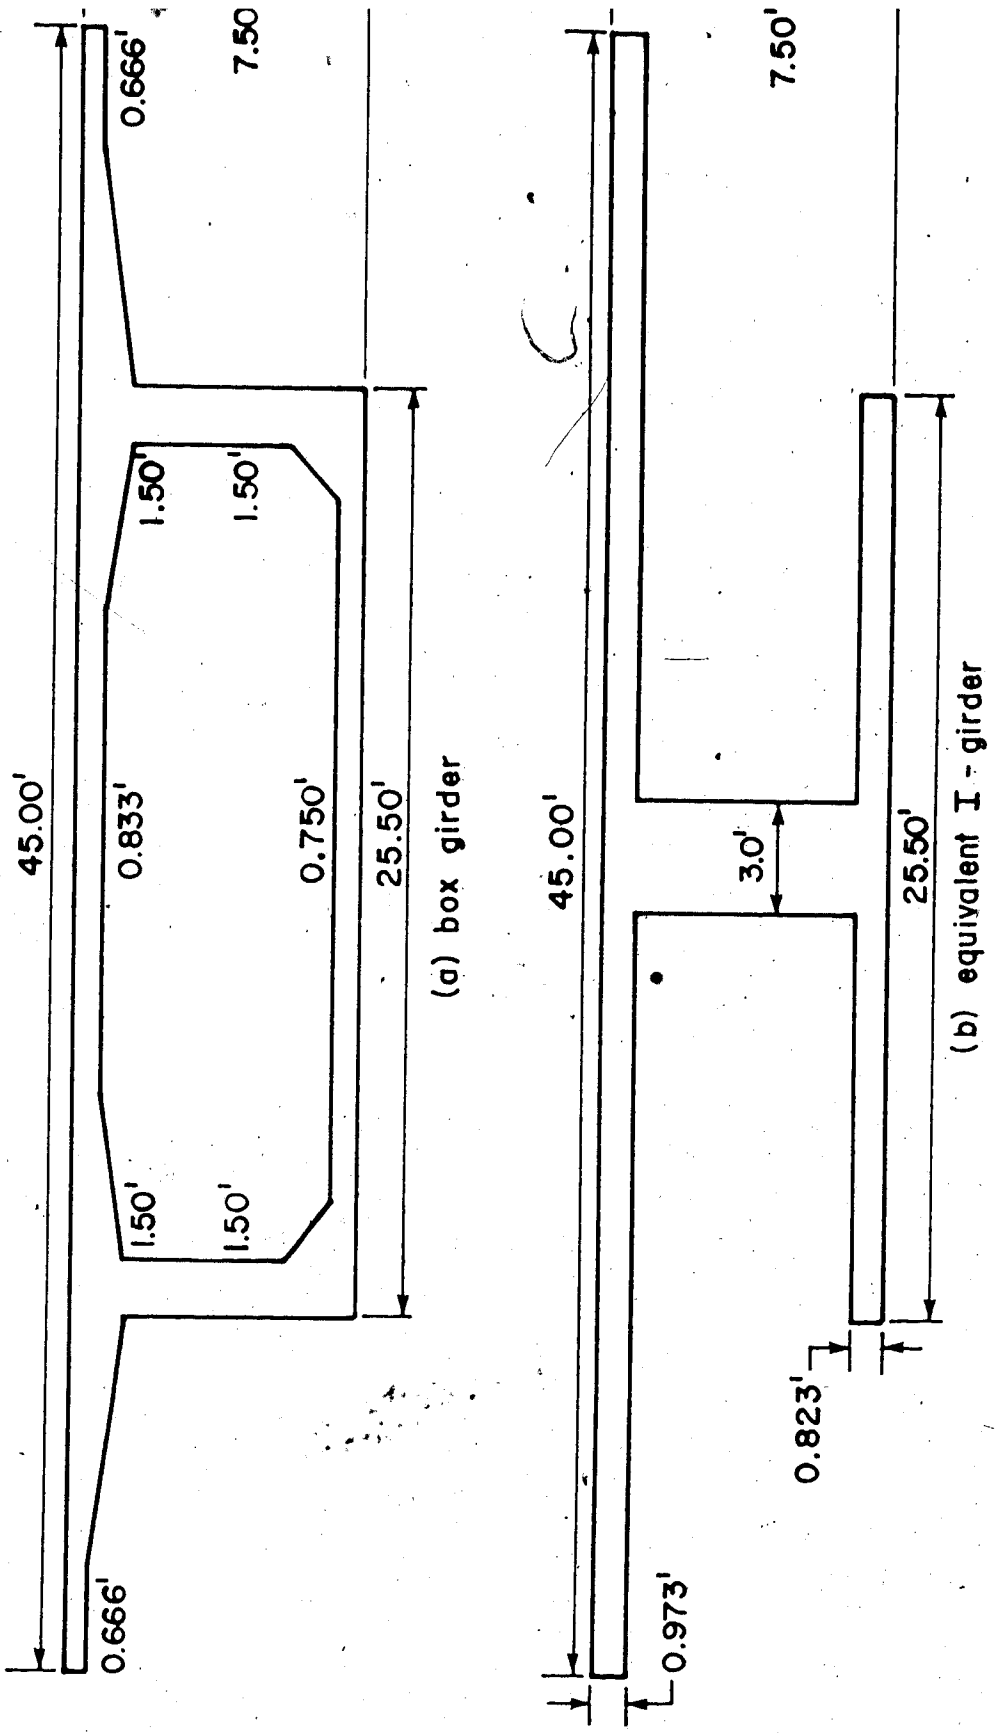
Discretization of a box girder as an equivalent I-girder
